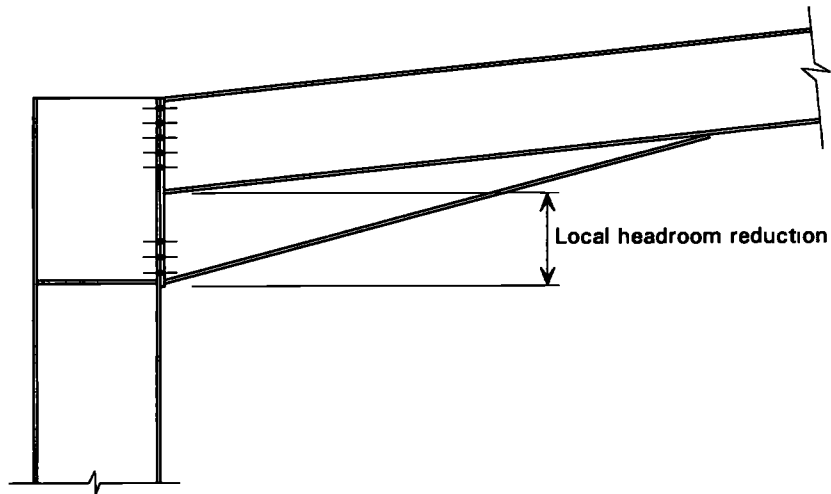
Column/rafter connection showing local headroom reduction
